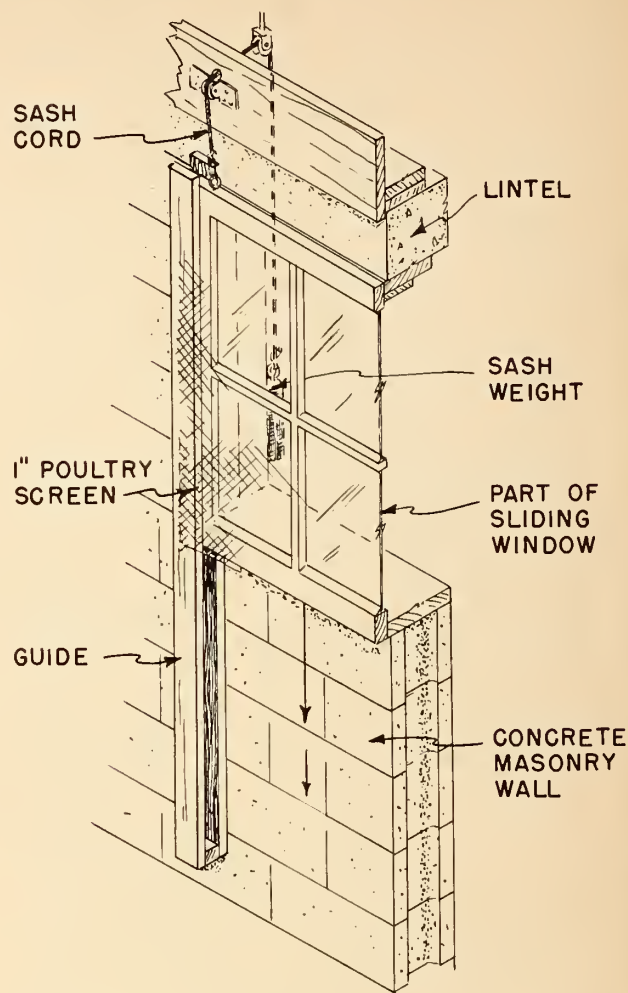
Counterbalanced window hung outside masonry wall.
